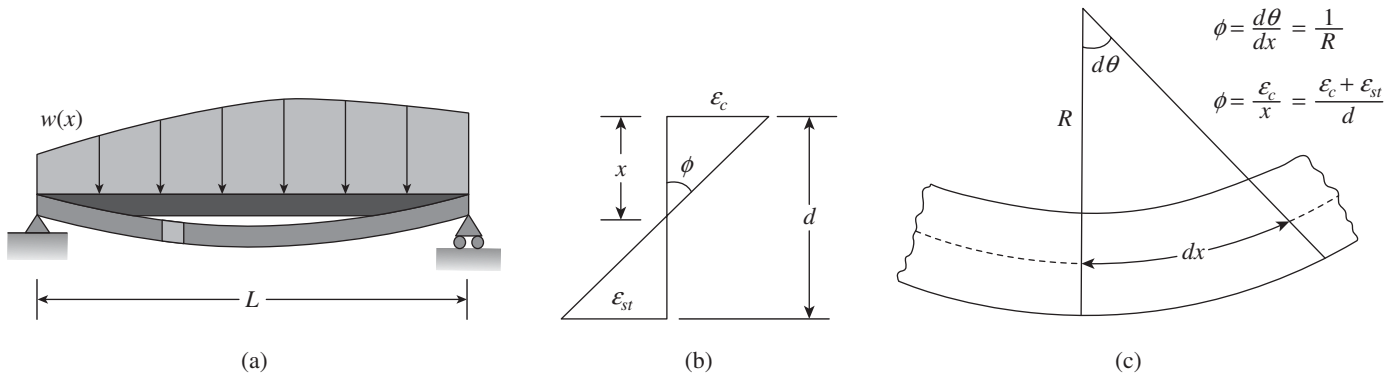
Rotation of a section in bending (a) Simply supported beam (b) Strain distribution across the section (c) Element of a bent beam
